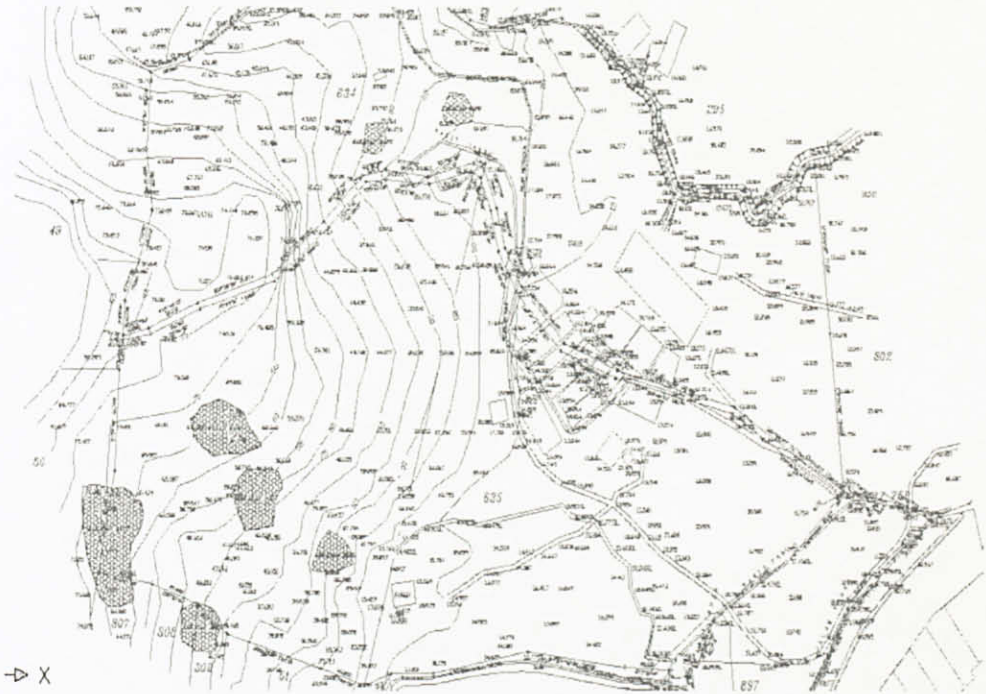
Project Layout Plan of SP Setia Bhd, Cangkat Sungai Ara, Relau, Penang.
